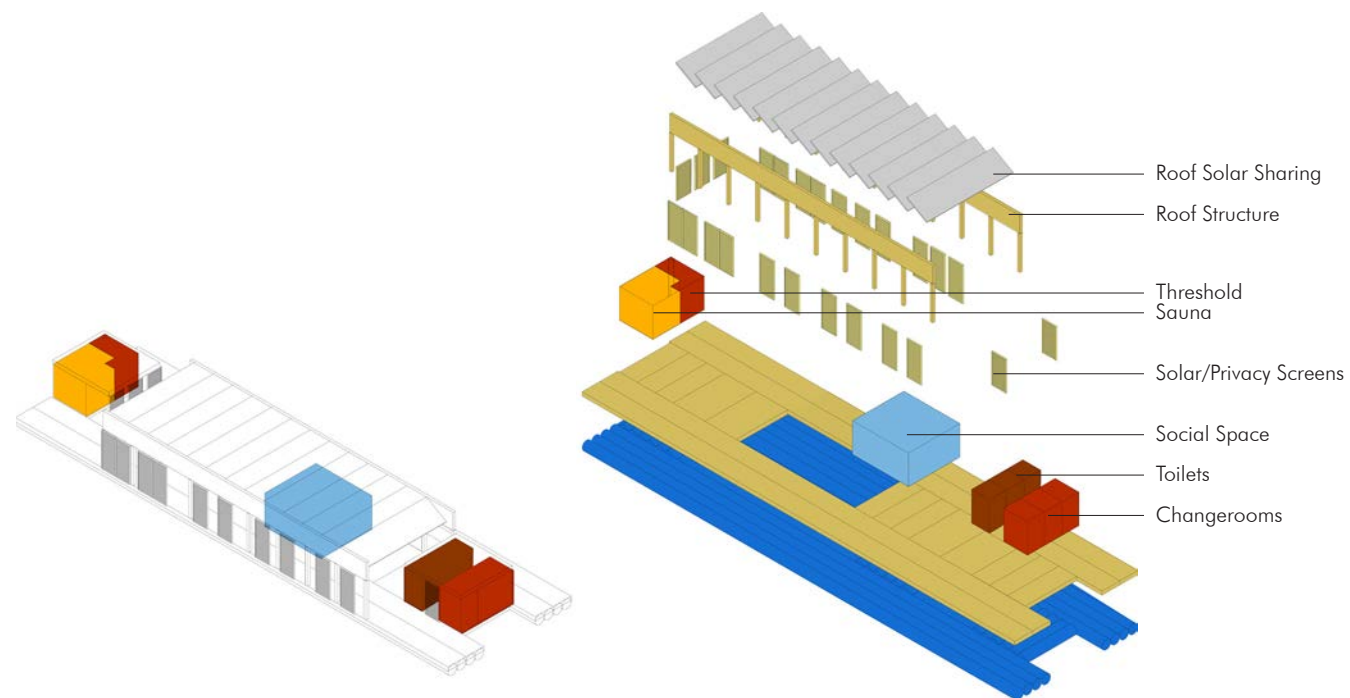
(left) Axonometric program drawing of the community sauna. (right) Exploded axonometric program drawing. Drawing by author.
